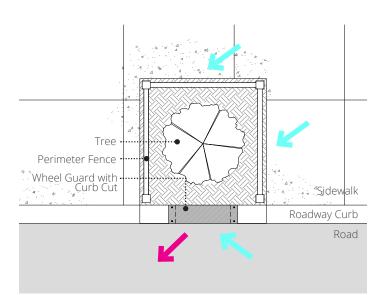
STORMWATER TREE INFLOW AND OUTFLOW PLAN
